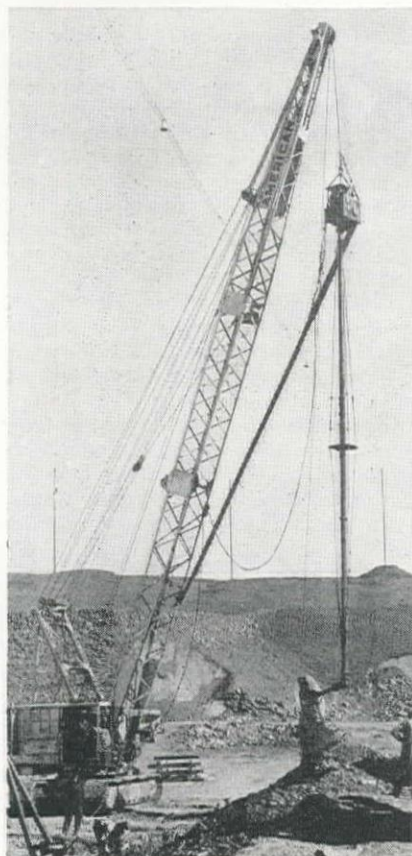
General view of the excavation and foundation work on the gate structure. Foundation consisted of 467-5-ft. diameter concrete piles placed in bored holes, and a 10-ft. cutoff trench 30 ft. deep. The piles support a reinforced concrete foundation slab 75 ft. wide by 12 ft. thick on which rest the piers for the gates. Concrete placing is under way on the foundation slab in the background and the boring of the holes for the piles is under way at the left.
